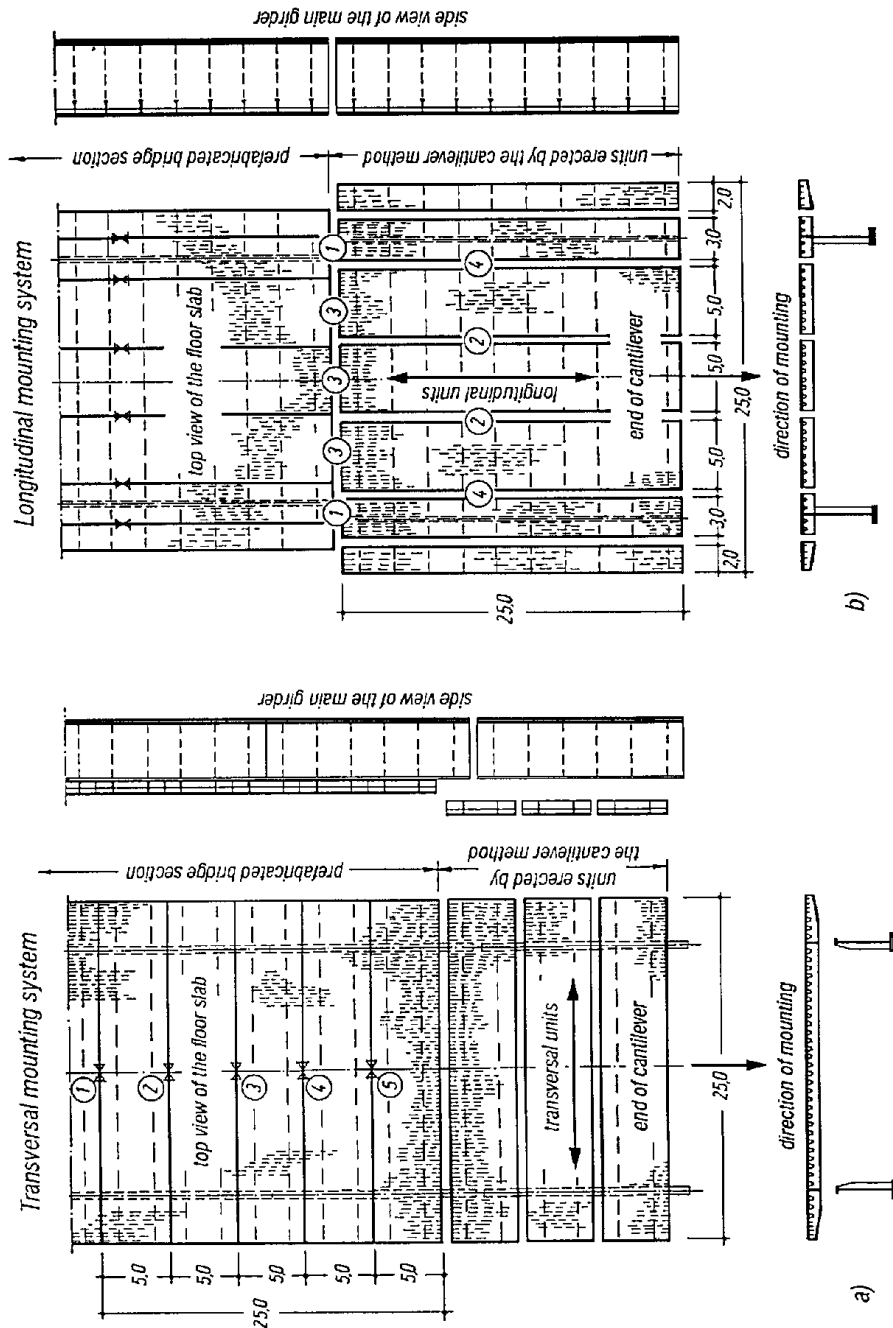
Division of an orthotropic steel bridge floor structure, using welded joints, in the context of the cantilever method of erection. a) transversal mounting system; b) longitudinal mounting system.
